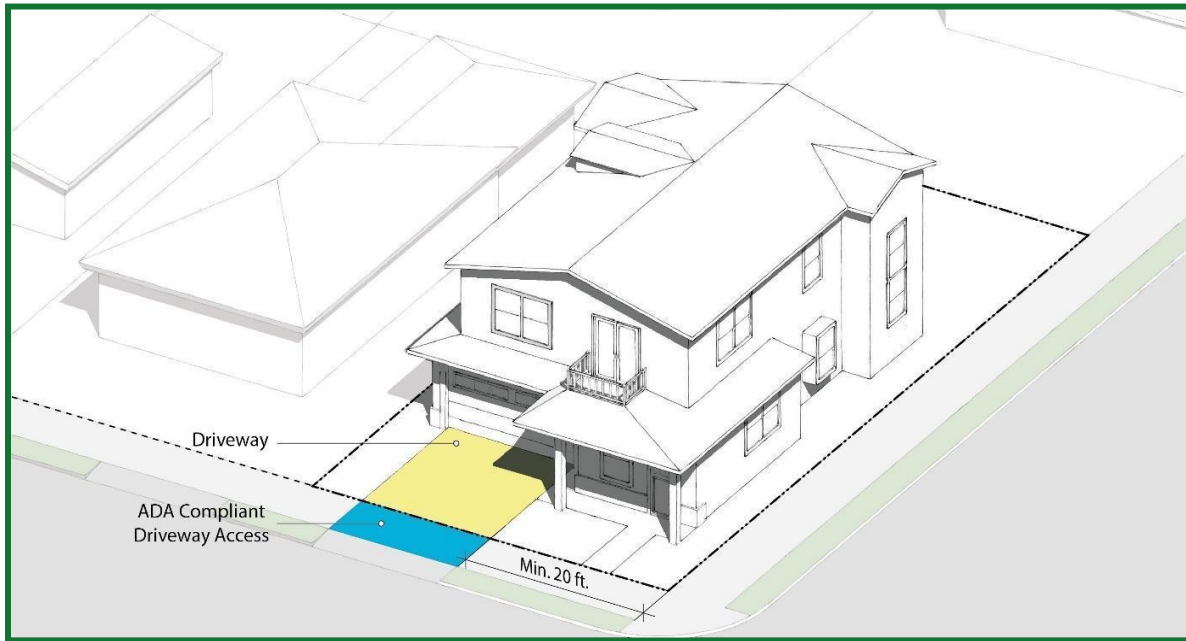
A-2: PARKING AND DRIVEWAY - RS DISTRICTS
